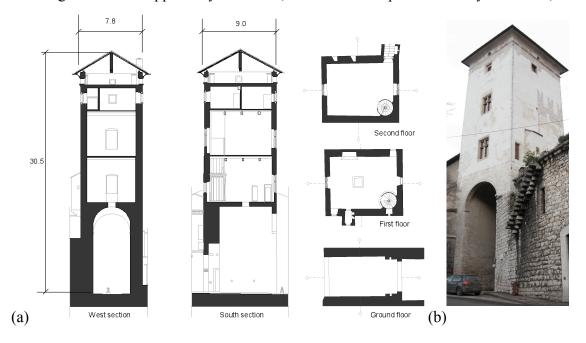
Plan view and cross sections of the tower of Aquila (a); Overview of the tower (b).
